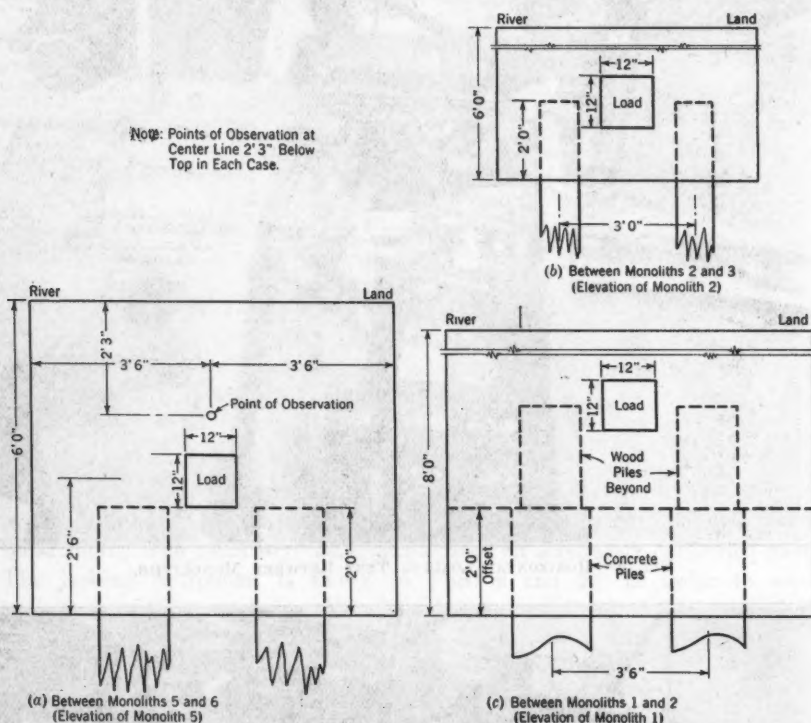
POSITION OF 350-TON, MANUALLY-OPERATED HYDRAULIC JACK IN LATERAL PILE-LOADING TESTS.
